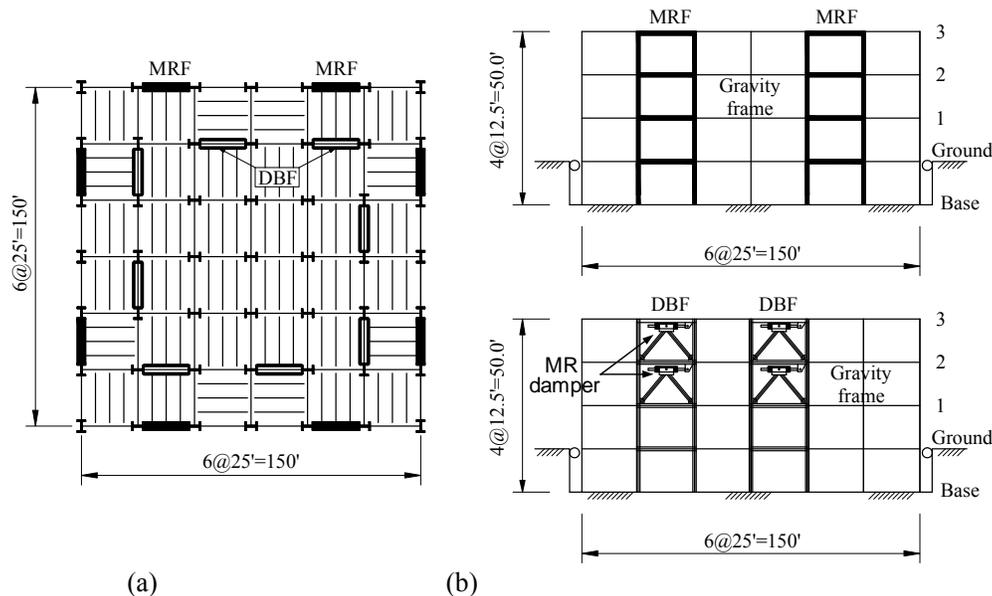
Prototype 3-story building structure for real-time hybrid simulations: (a) floor plan; (b) elevation
